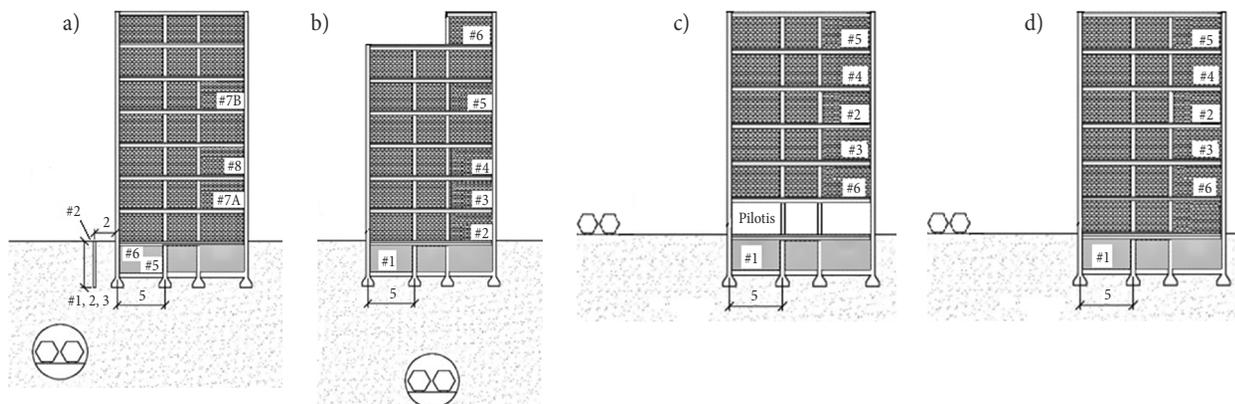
Cross-section of the: a – PPC building and measurement locations; b – Mourouzi street building; c – Maroussi 1 building; d – Maroussi 2 building
